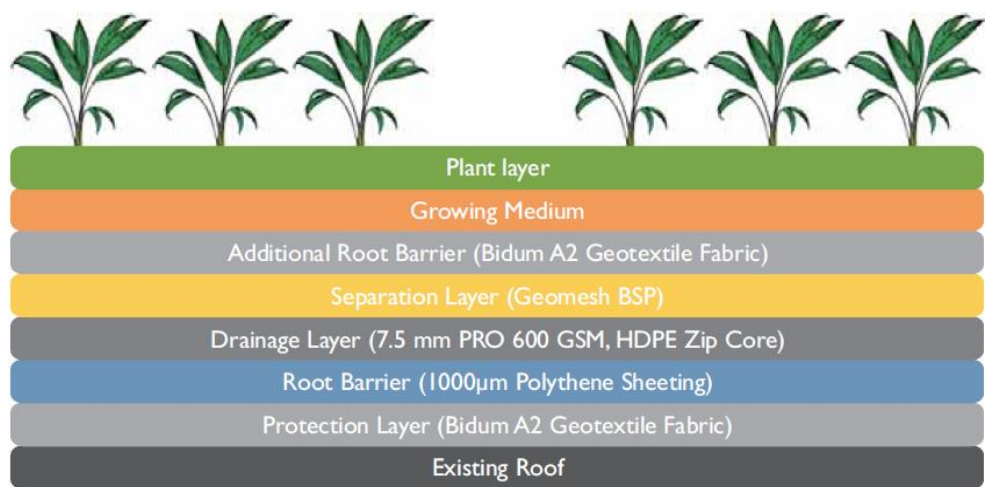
Schematic diagram showing layers of different materials installed to protect the existing roof of the building.
